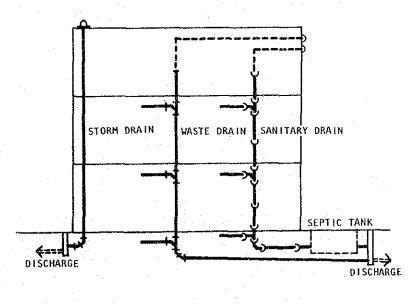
DRAINAGE SYSTEM DIAGRAM
